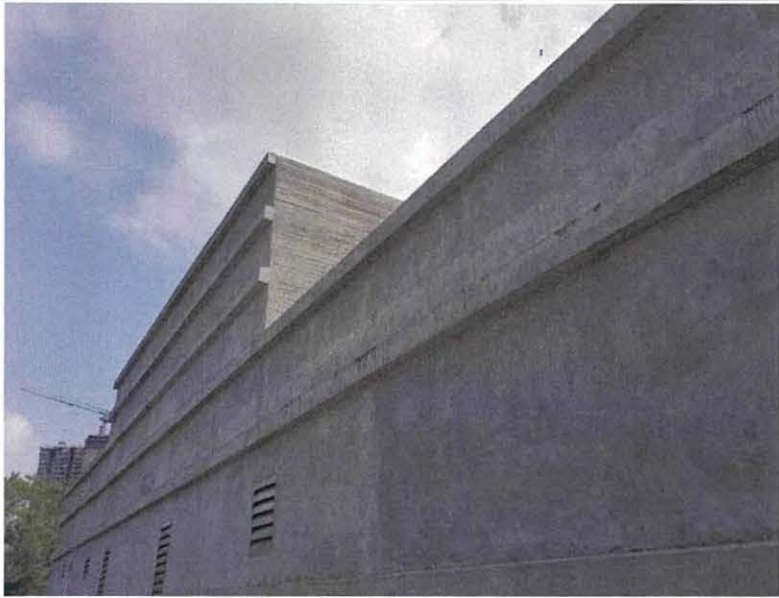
Silencer installed at outlet of extraction fans (View B)
